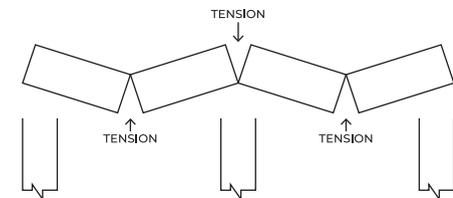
Typical Points Of Max. Tension In a Continuous Concrete Member
